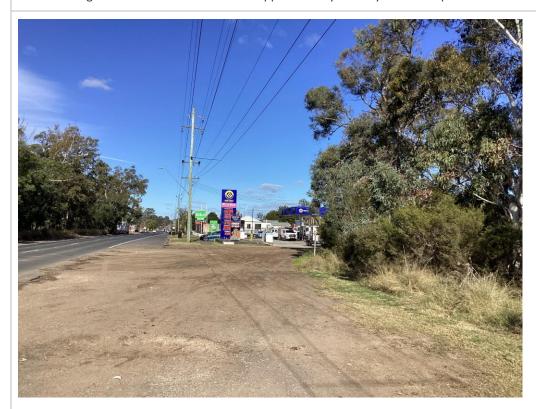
Petrol station located west of the Site, opposite to the RAAF Base Londonderry
